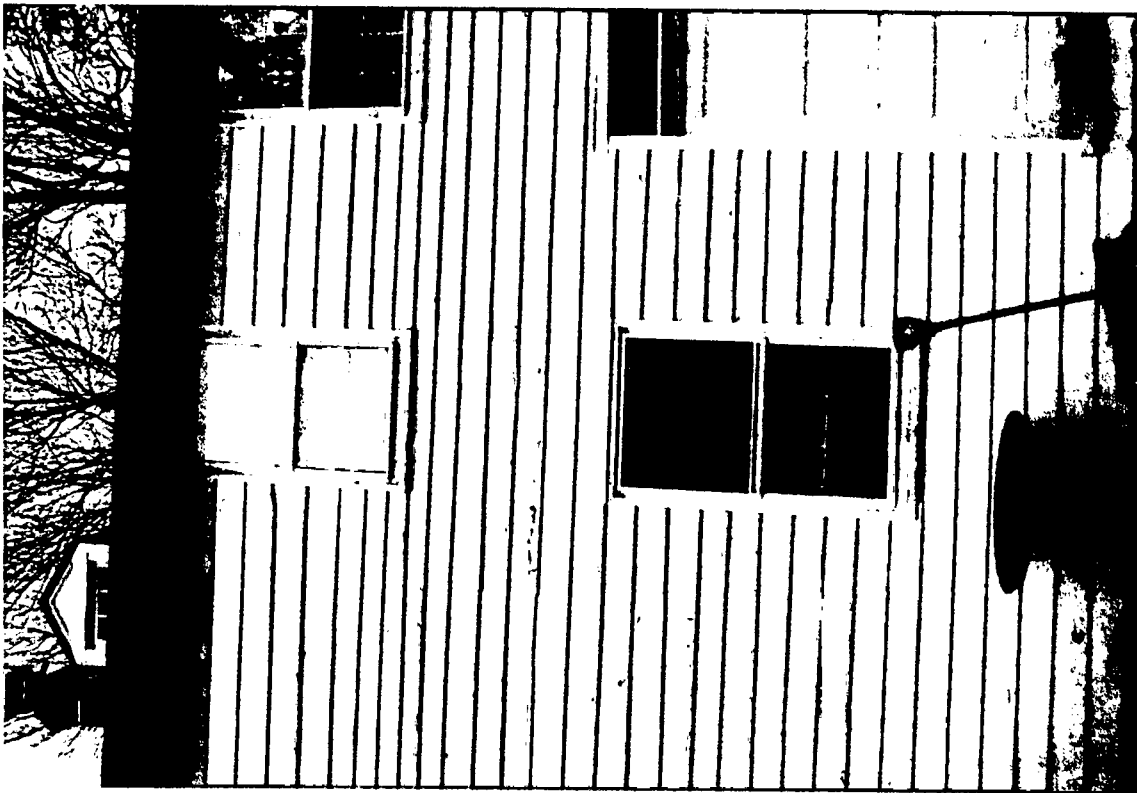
DETAIL - REAR ELEVATION OF INSIDE CORNER ADDITION
